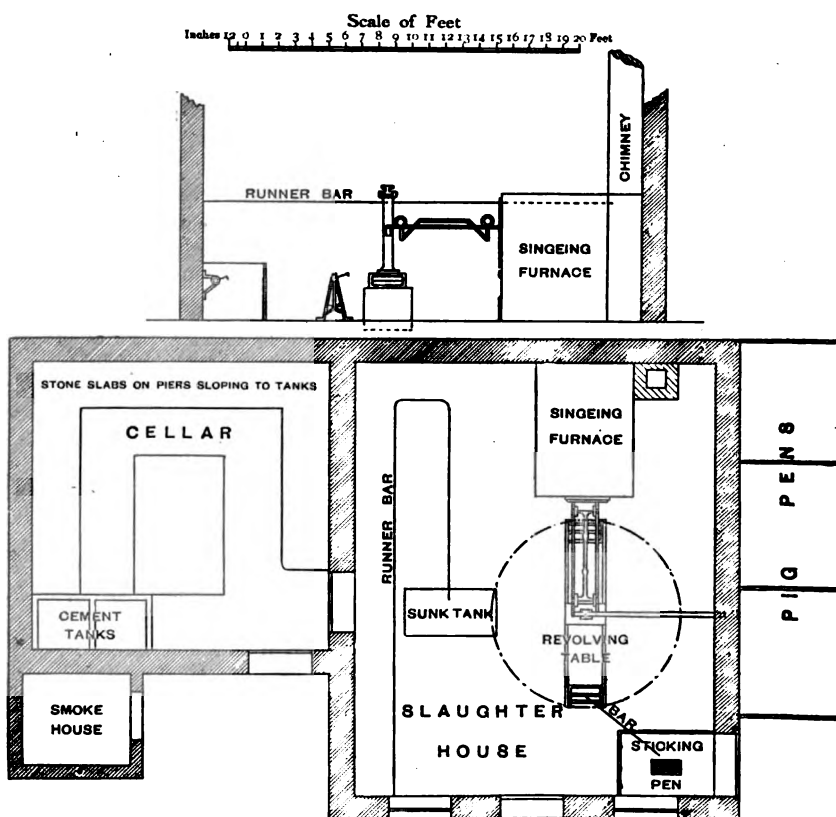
Ground plan and section through slaughter house of bacon factory capable of working up 50 pigs per week.
